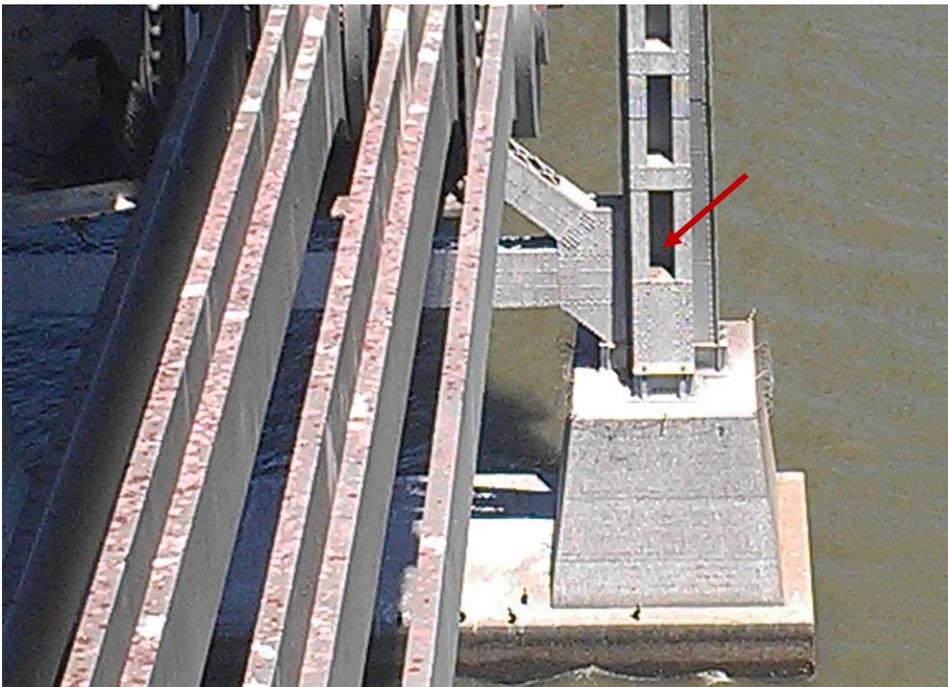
Peregrine falcon 2014 nest site located in a west-facing alcove at the base of the south tower of Pier E8.
